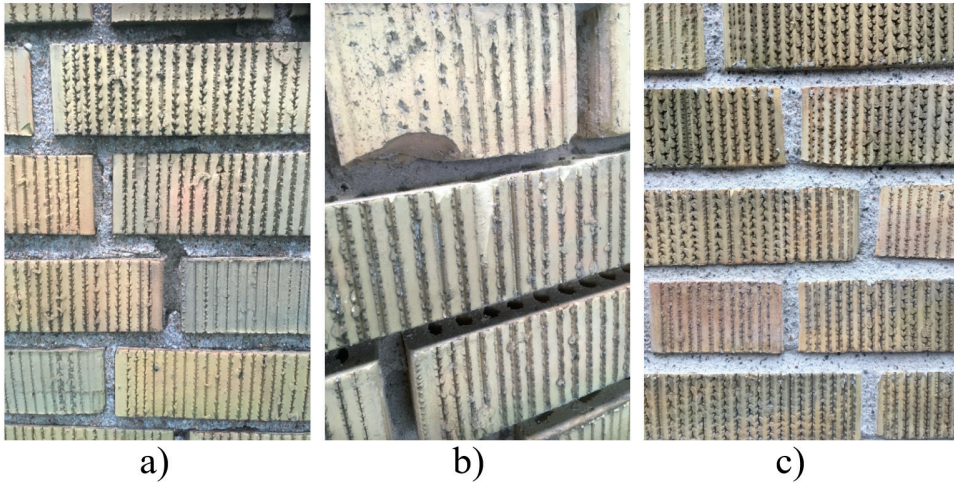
A clay brick masonry façade, before and after repointing a) the initial state where mortar joints were eroded; b) mortar joints were raked out up to the depth of 25 mm; c) new mortar was pointed.
